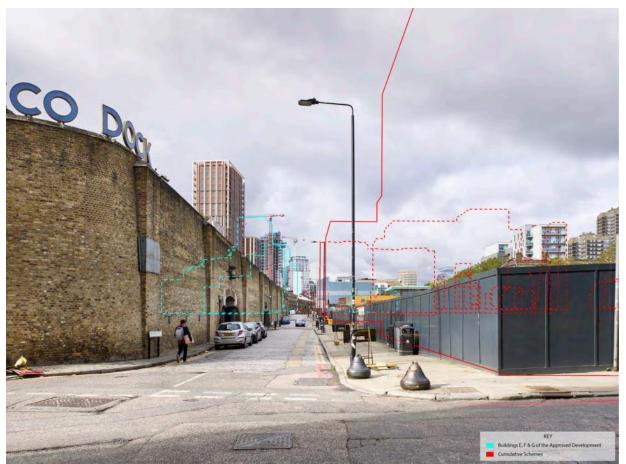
View showing proposal in the background (to left) of Tobacco Dock and Pennington Street Warehouses (View 20 of TVHA)
